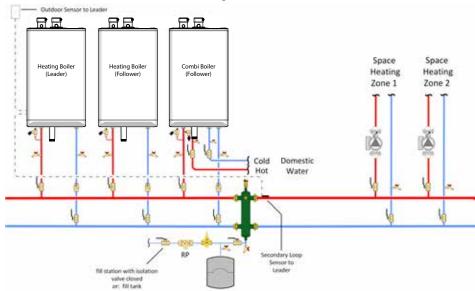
Typical Heating Boiler and Combi Boiler cascade piping – concept drawing. This drawing is only a simple schematic guide
